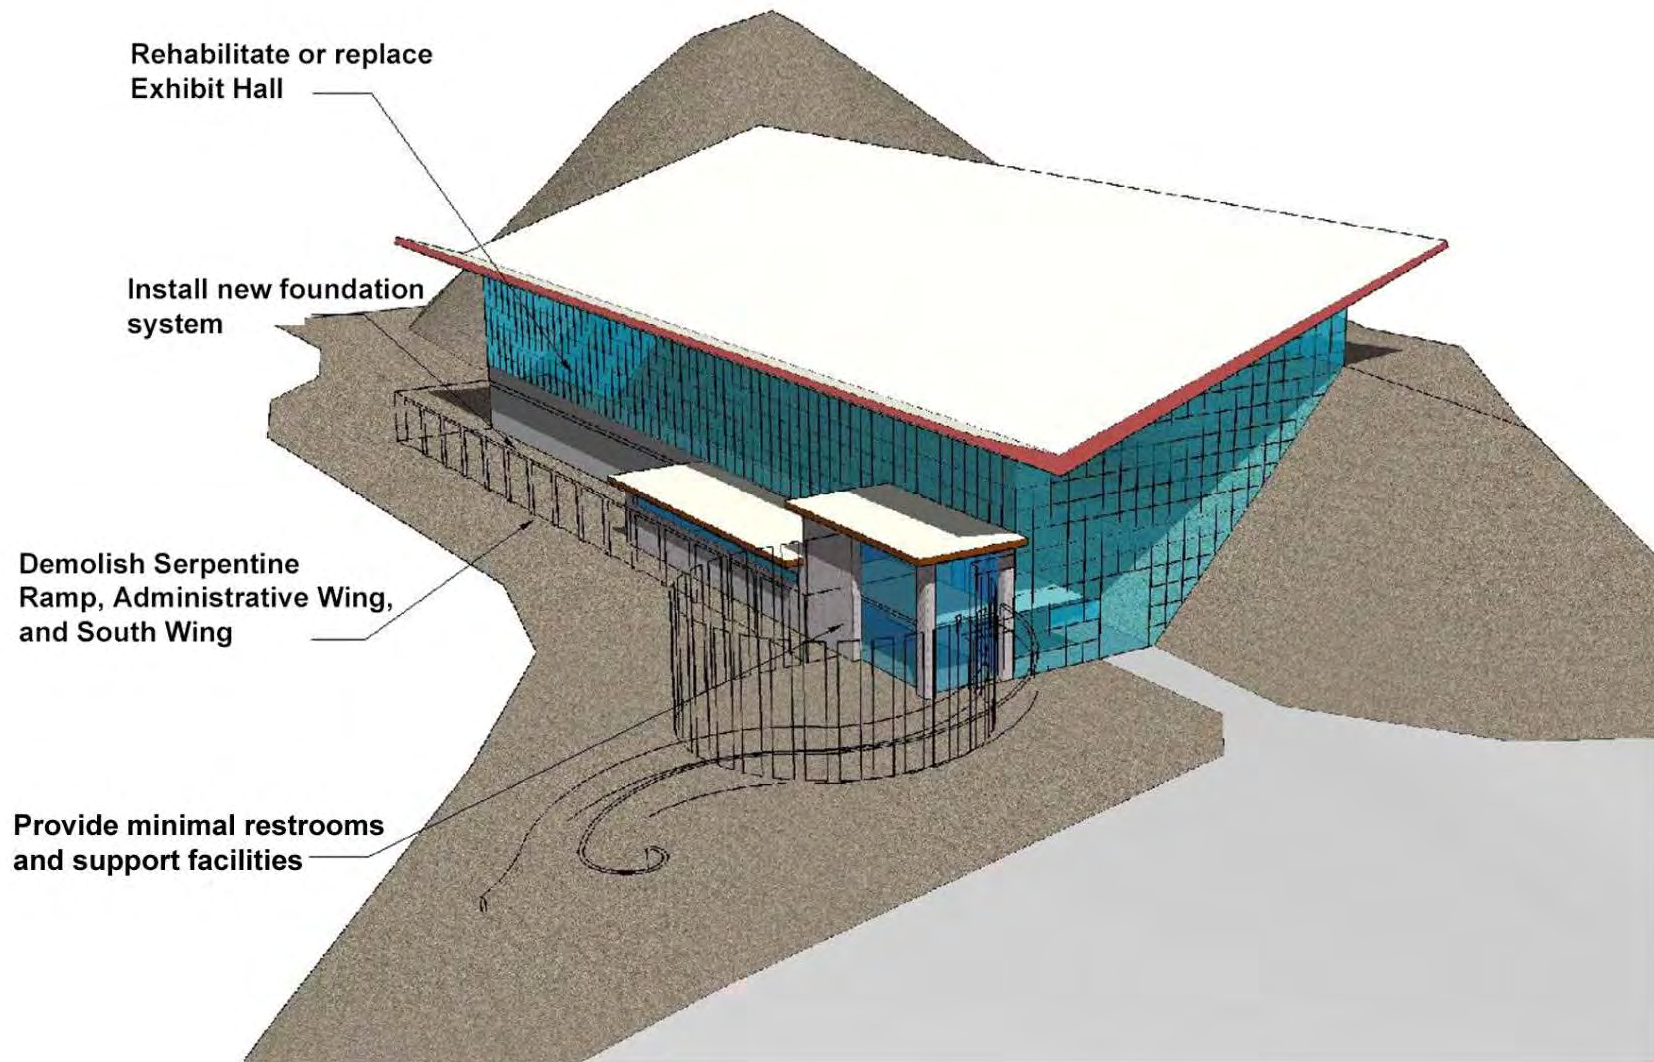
ALTERNATIVE B EXHIBIT HALL CONCEPT
